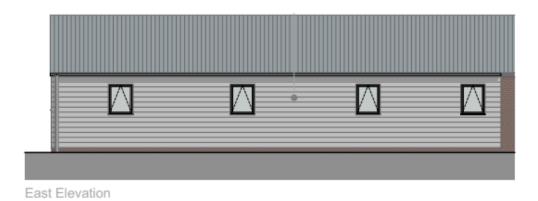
Proposed Elevations (Source: Drawing No. 21.036627.110)
